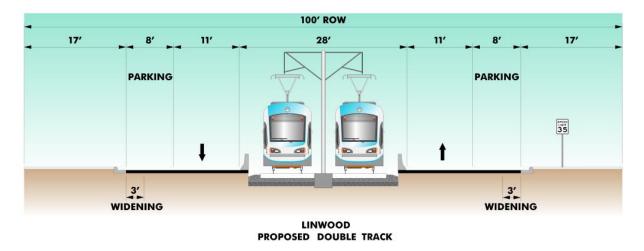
Enhanced Streetcar Linwood Blvd Typical Section
